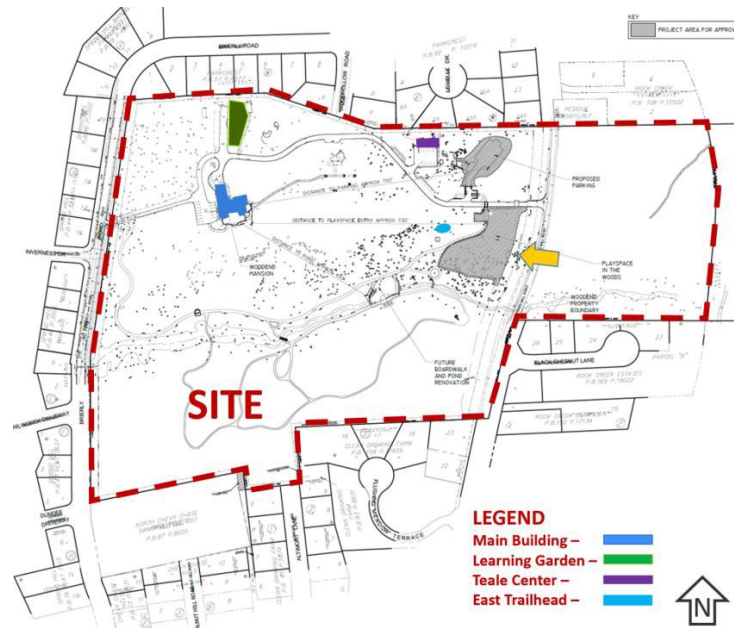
Parking and Drop-Off/Pick-Up Facilities
